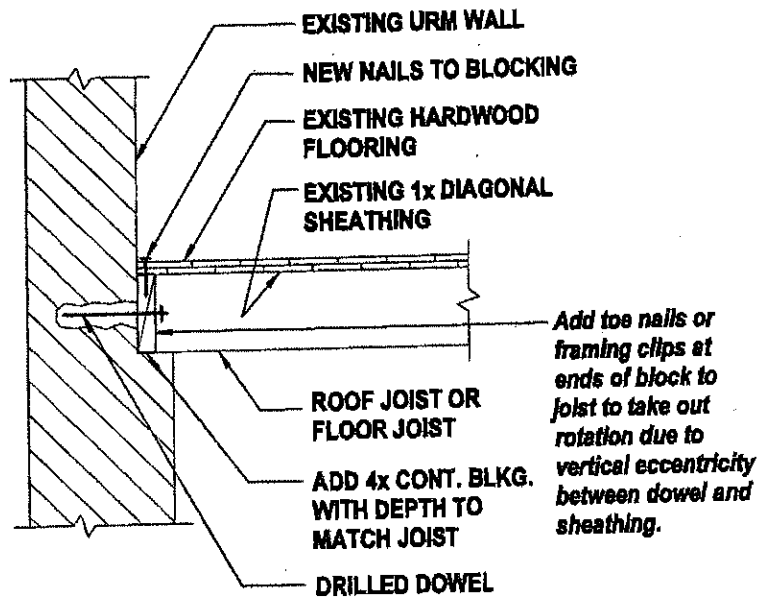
Tension Anchors Installed from Below the Floor
